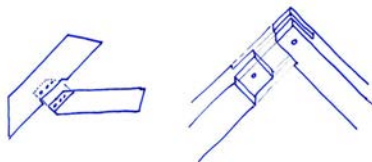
19. Connections for roof trusses. Note face nailed connections are more likely.
